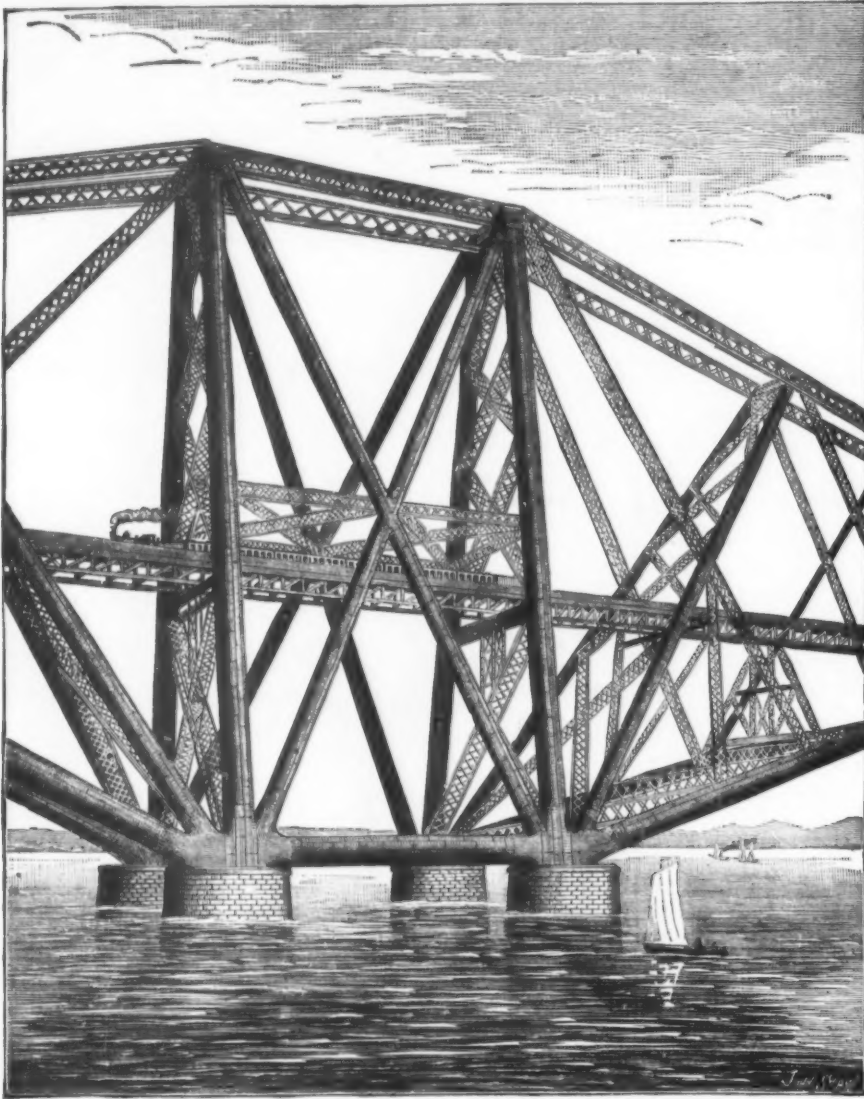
A MAIN CANTILEVER PIER—THE FORTH BRIDGE.
